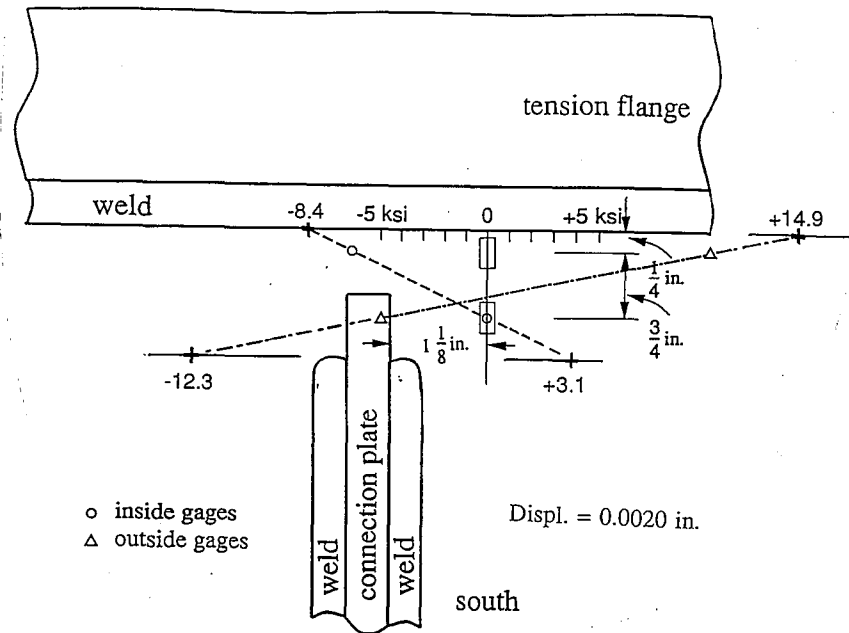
Static Stress Distribution for Inside Girder at Pier S7-12 Floorbeam Two with Dump Truck in Outside Lane (Worst Case)
